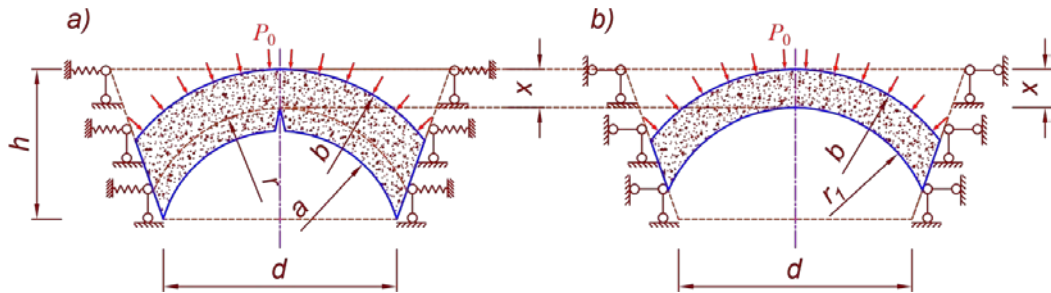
Calculation model for concrete end element with load bearing wall having very low stiffness:
